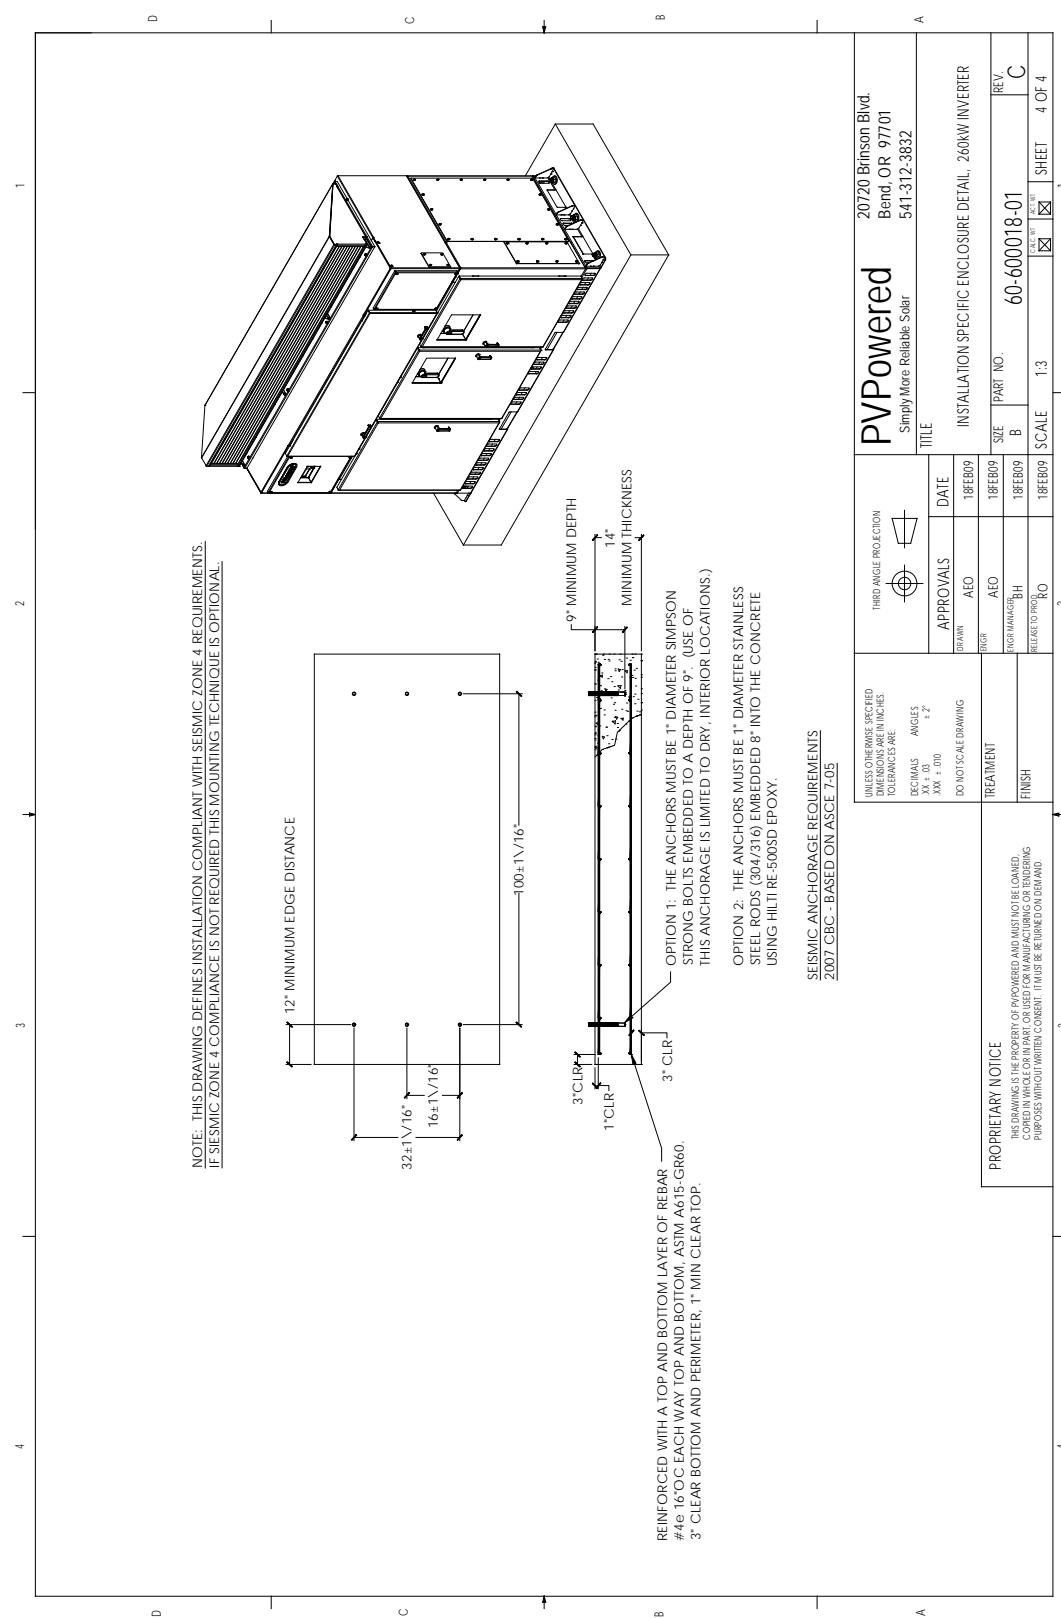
PVP250kW/PVP260kW Mechanical Drawing - View 4
